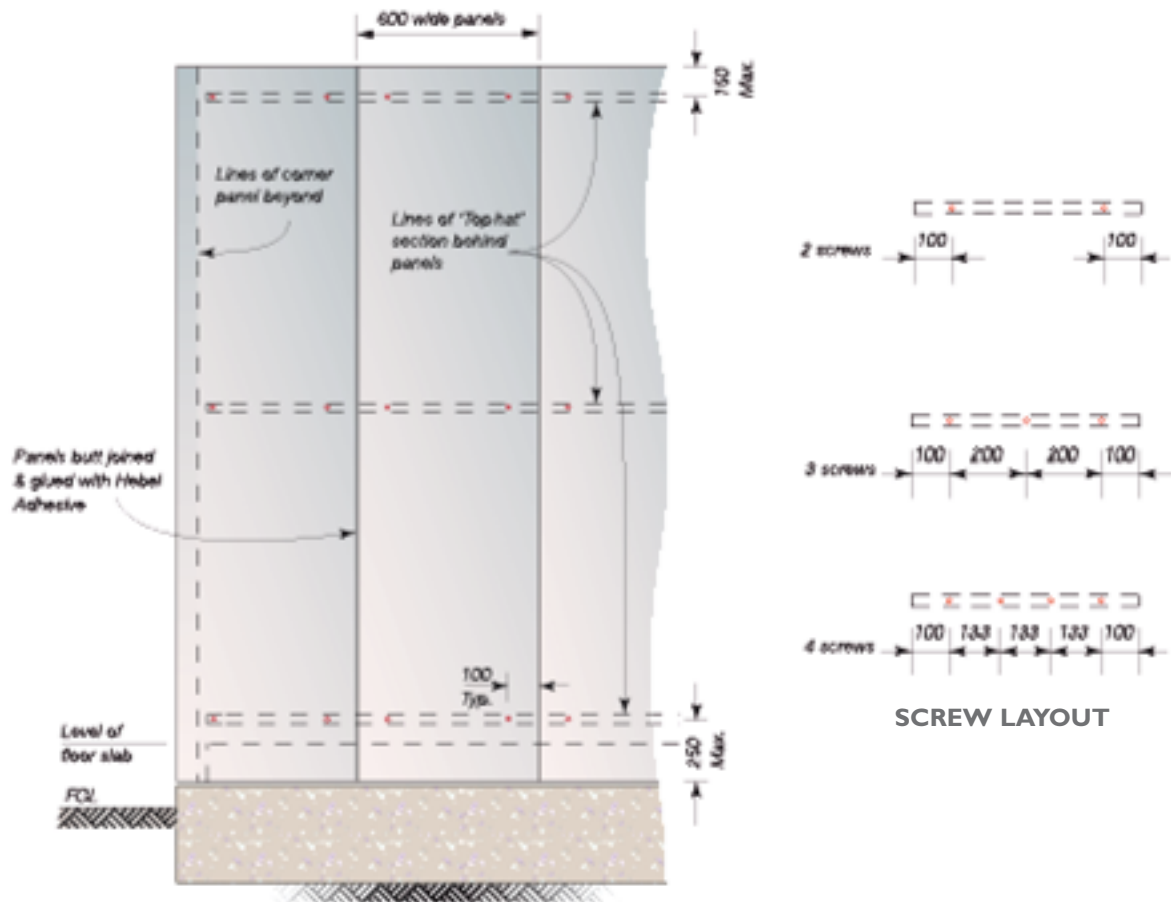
Hebel PowerPanel External Fixing Detail
